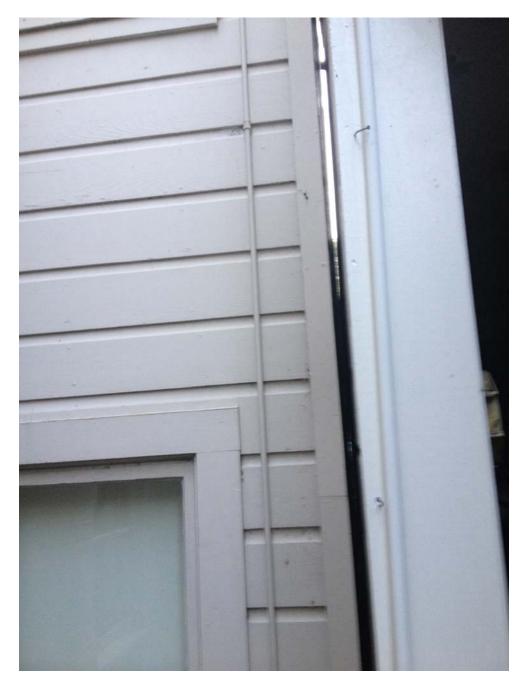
Gap between subject building (right) and DR Requester's building (left) (Sky is visible at street facades; top of gap is covered by Mr Zaretsky's sheet metal coping)
